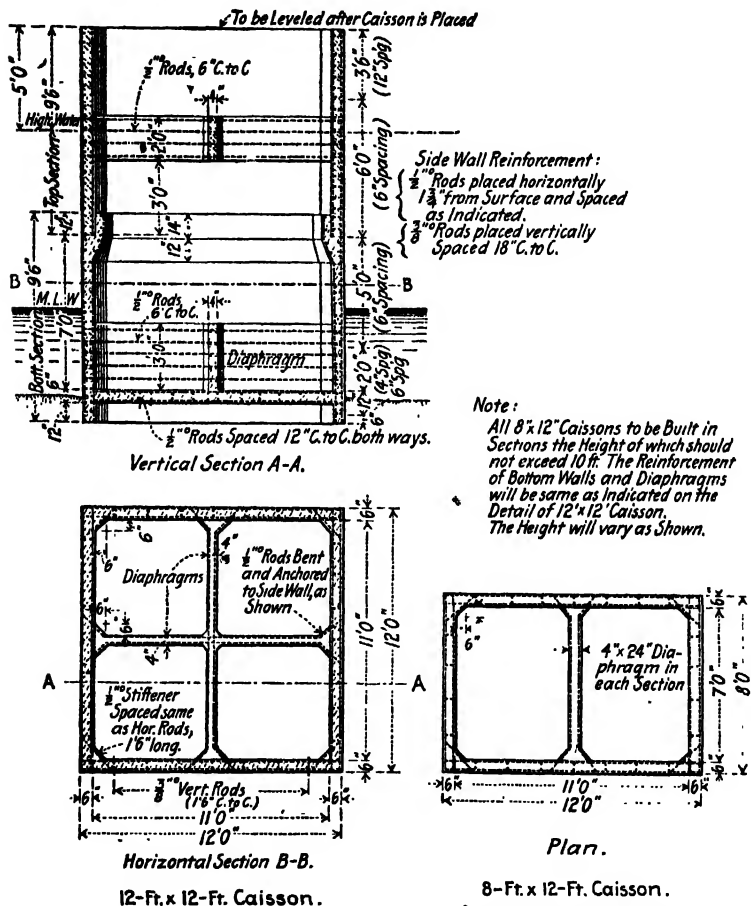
Box Caisson of Reinforced Concrete near Glen Cove, Long Island.
